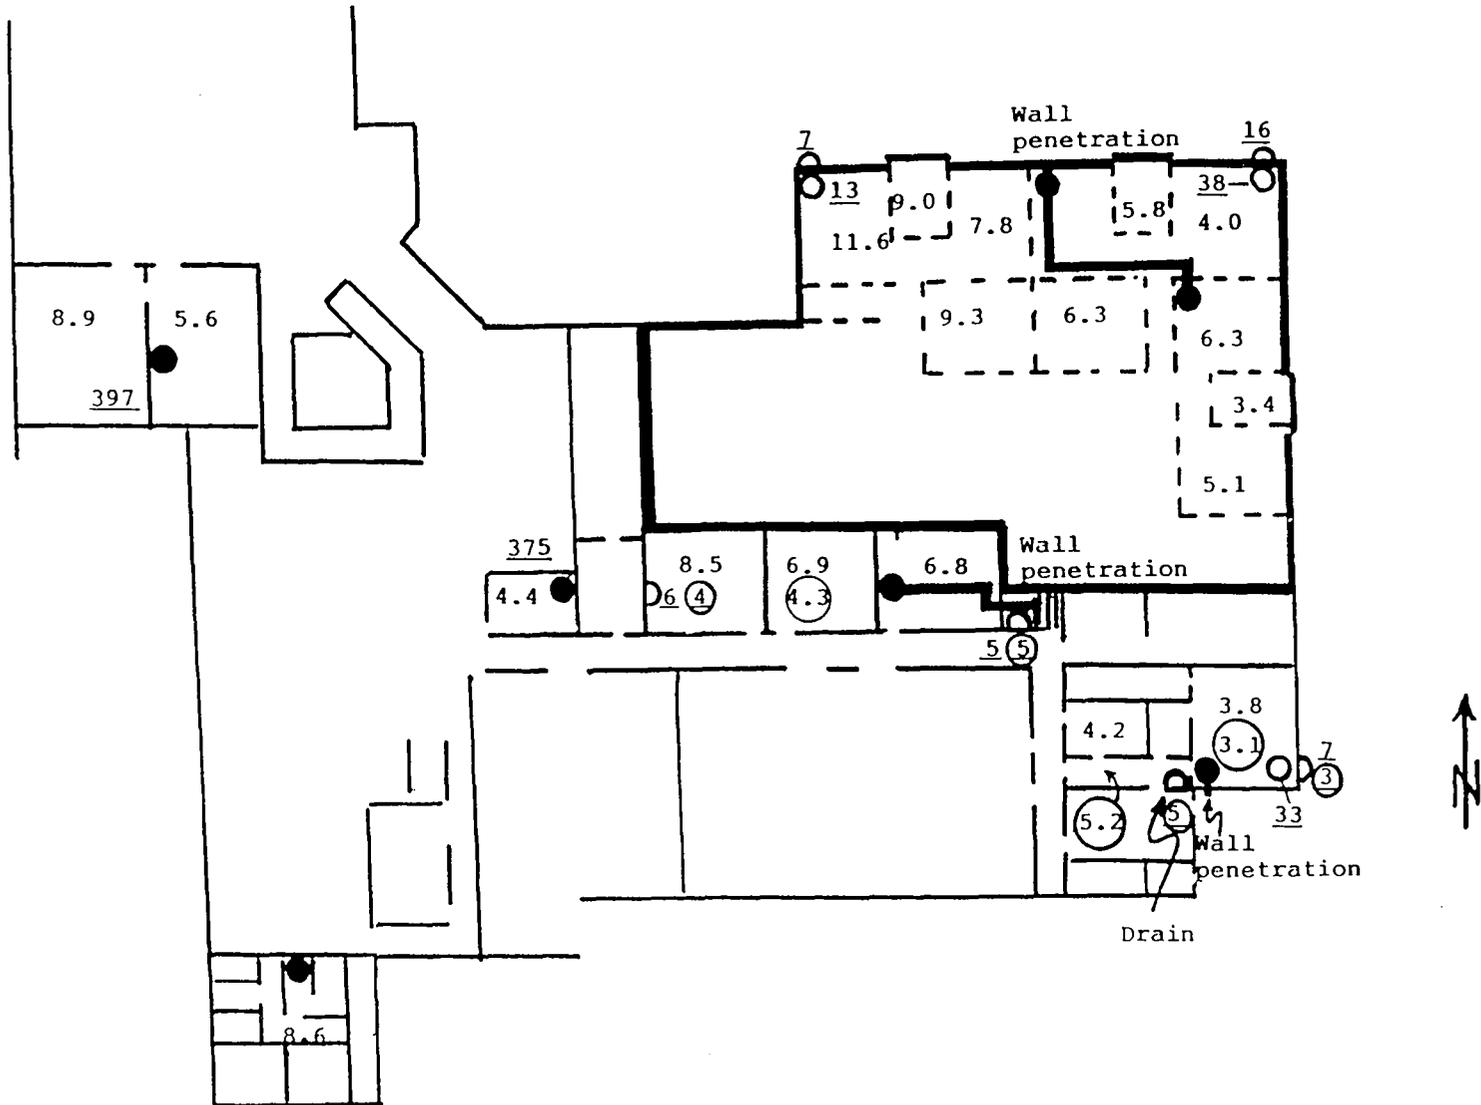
Martin Luther King Junior High School - Blockwall radon transport to second floor. Second floor slab-on-grade is outlined in bold with rooms in dashed lines. Where the second floor is above a first floor, radon levels are encircled.
